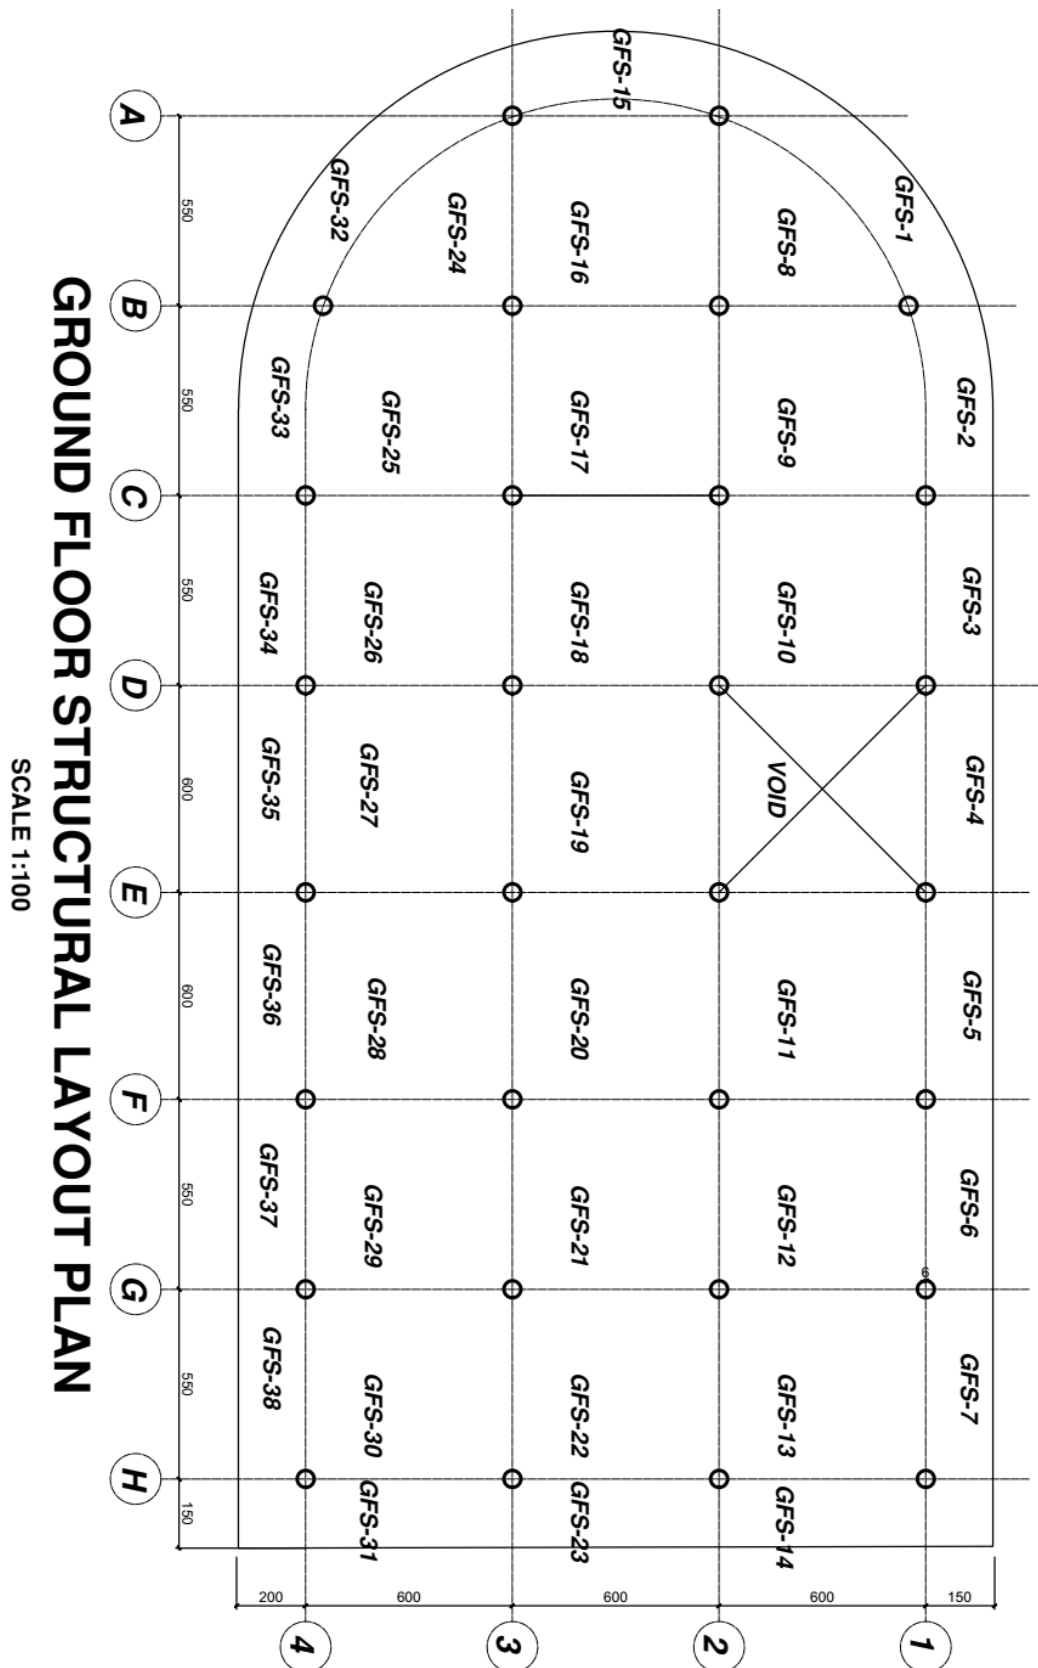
Ground floor structural layout plan for G+2, G+7 & G+12
